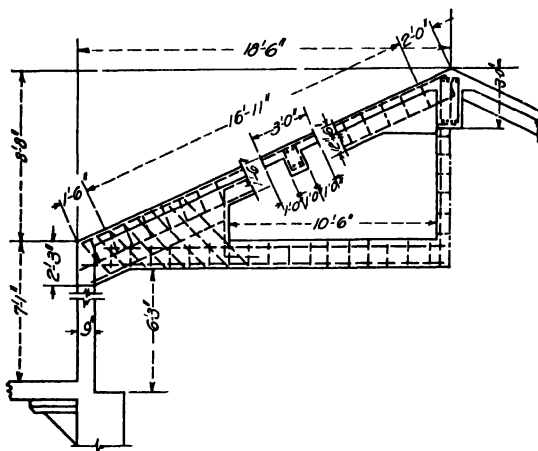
Details—Ford Motor Co. building, Chicago.
